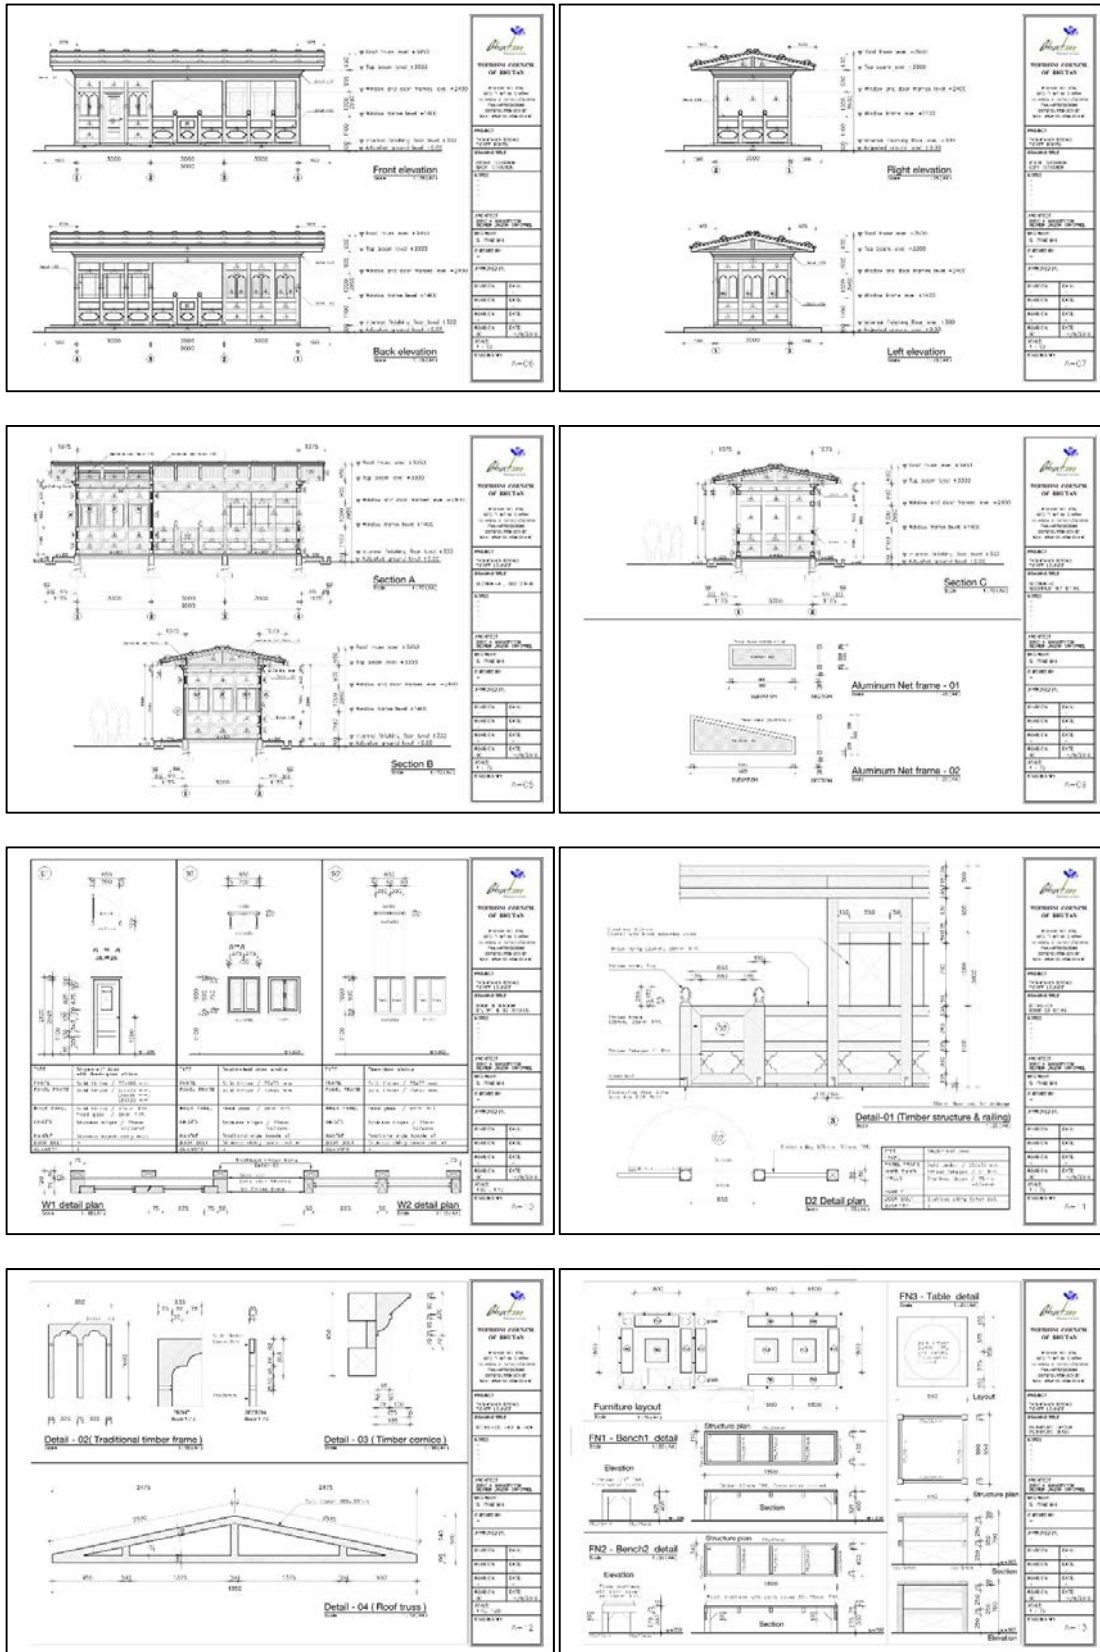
Construction drawings of Tashichho Dzong tourists lounge.
